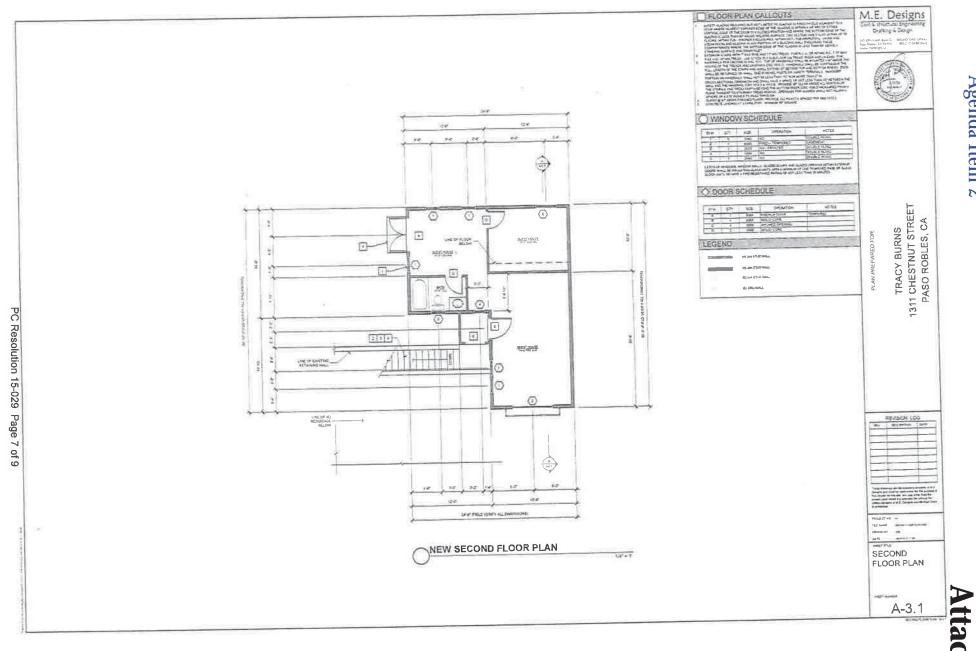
Exhibit E Second Floor Plan CUP 15-018 1311 Chestnut Street (Burns)
